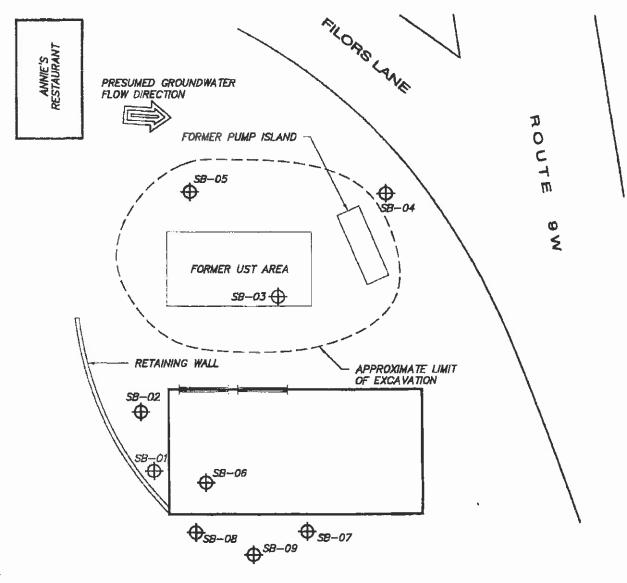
SITE PLAN 149 SOUTH LIBERTY DRIVE STONY POINT, NEW YORK HRP # ATWOOO1.P2 NOT TO SCALE ATTACHMENT #1
